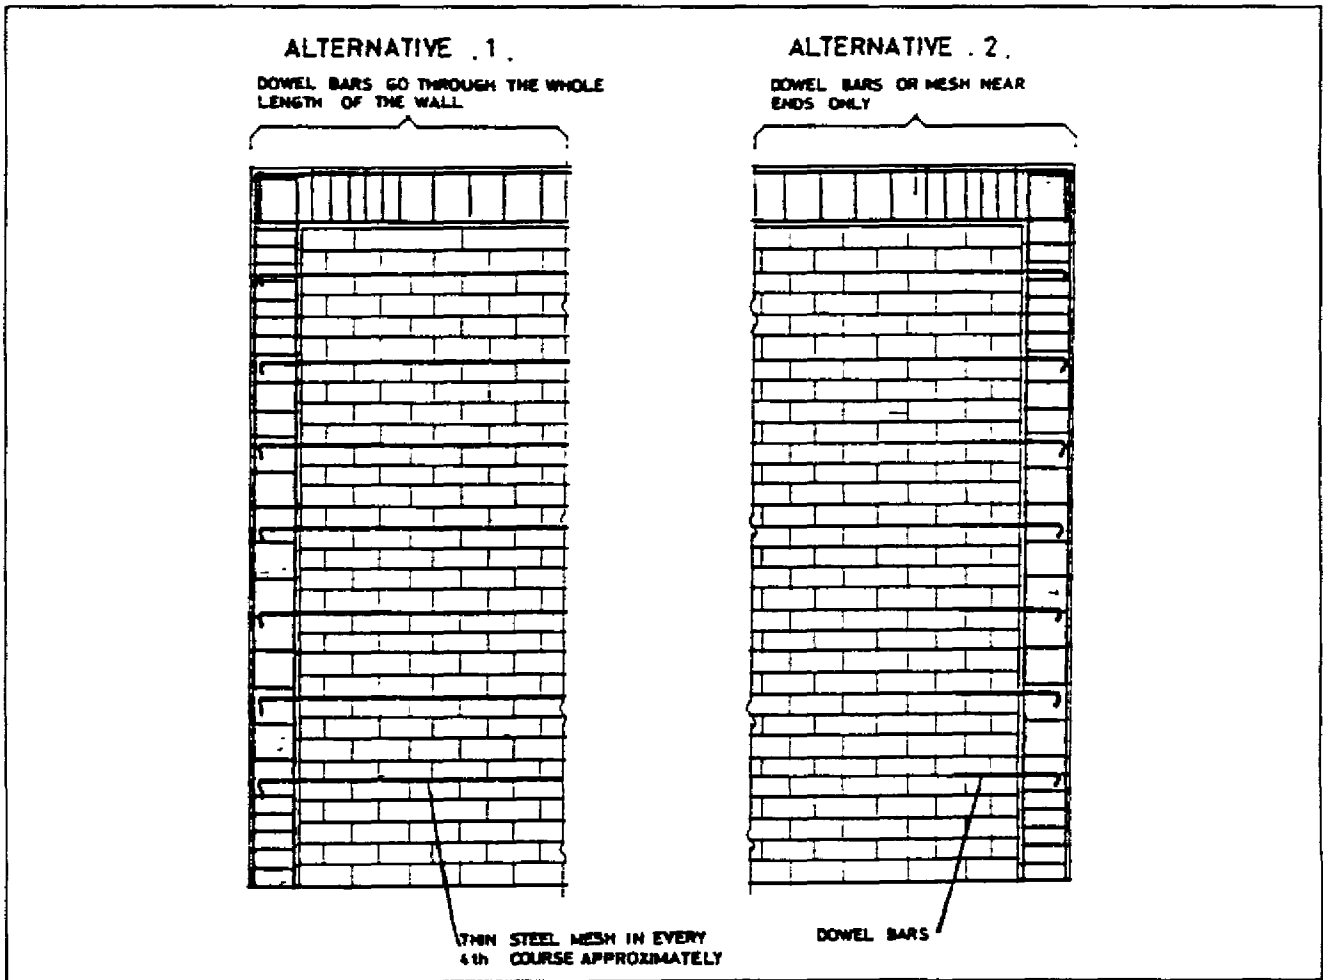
Brick Infill with RC Frame by Dowel Bars [1]
